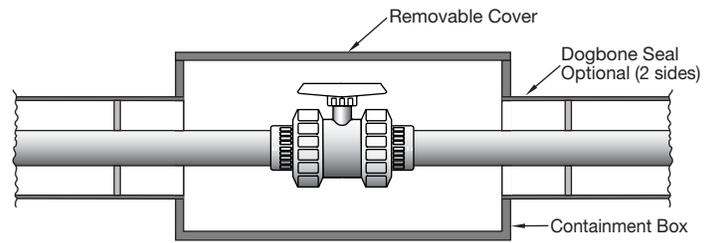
Double contained ball valve without stem extension: Poly-Flo system
